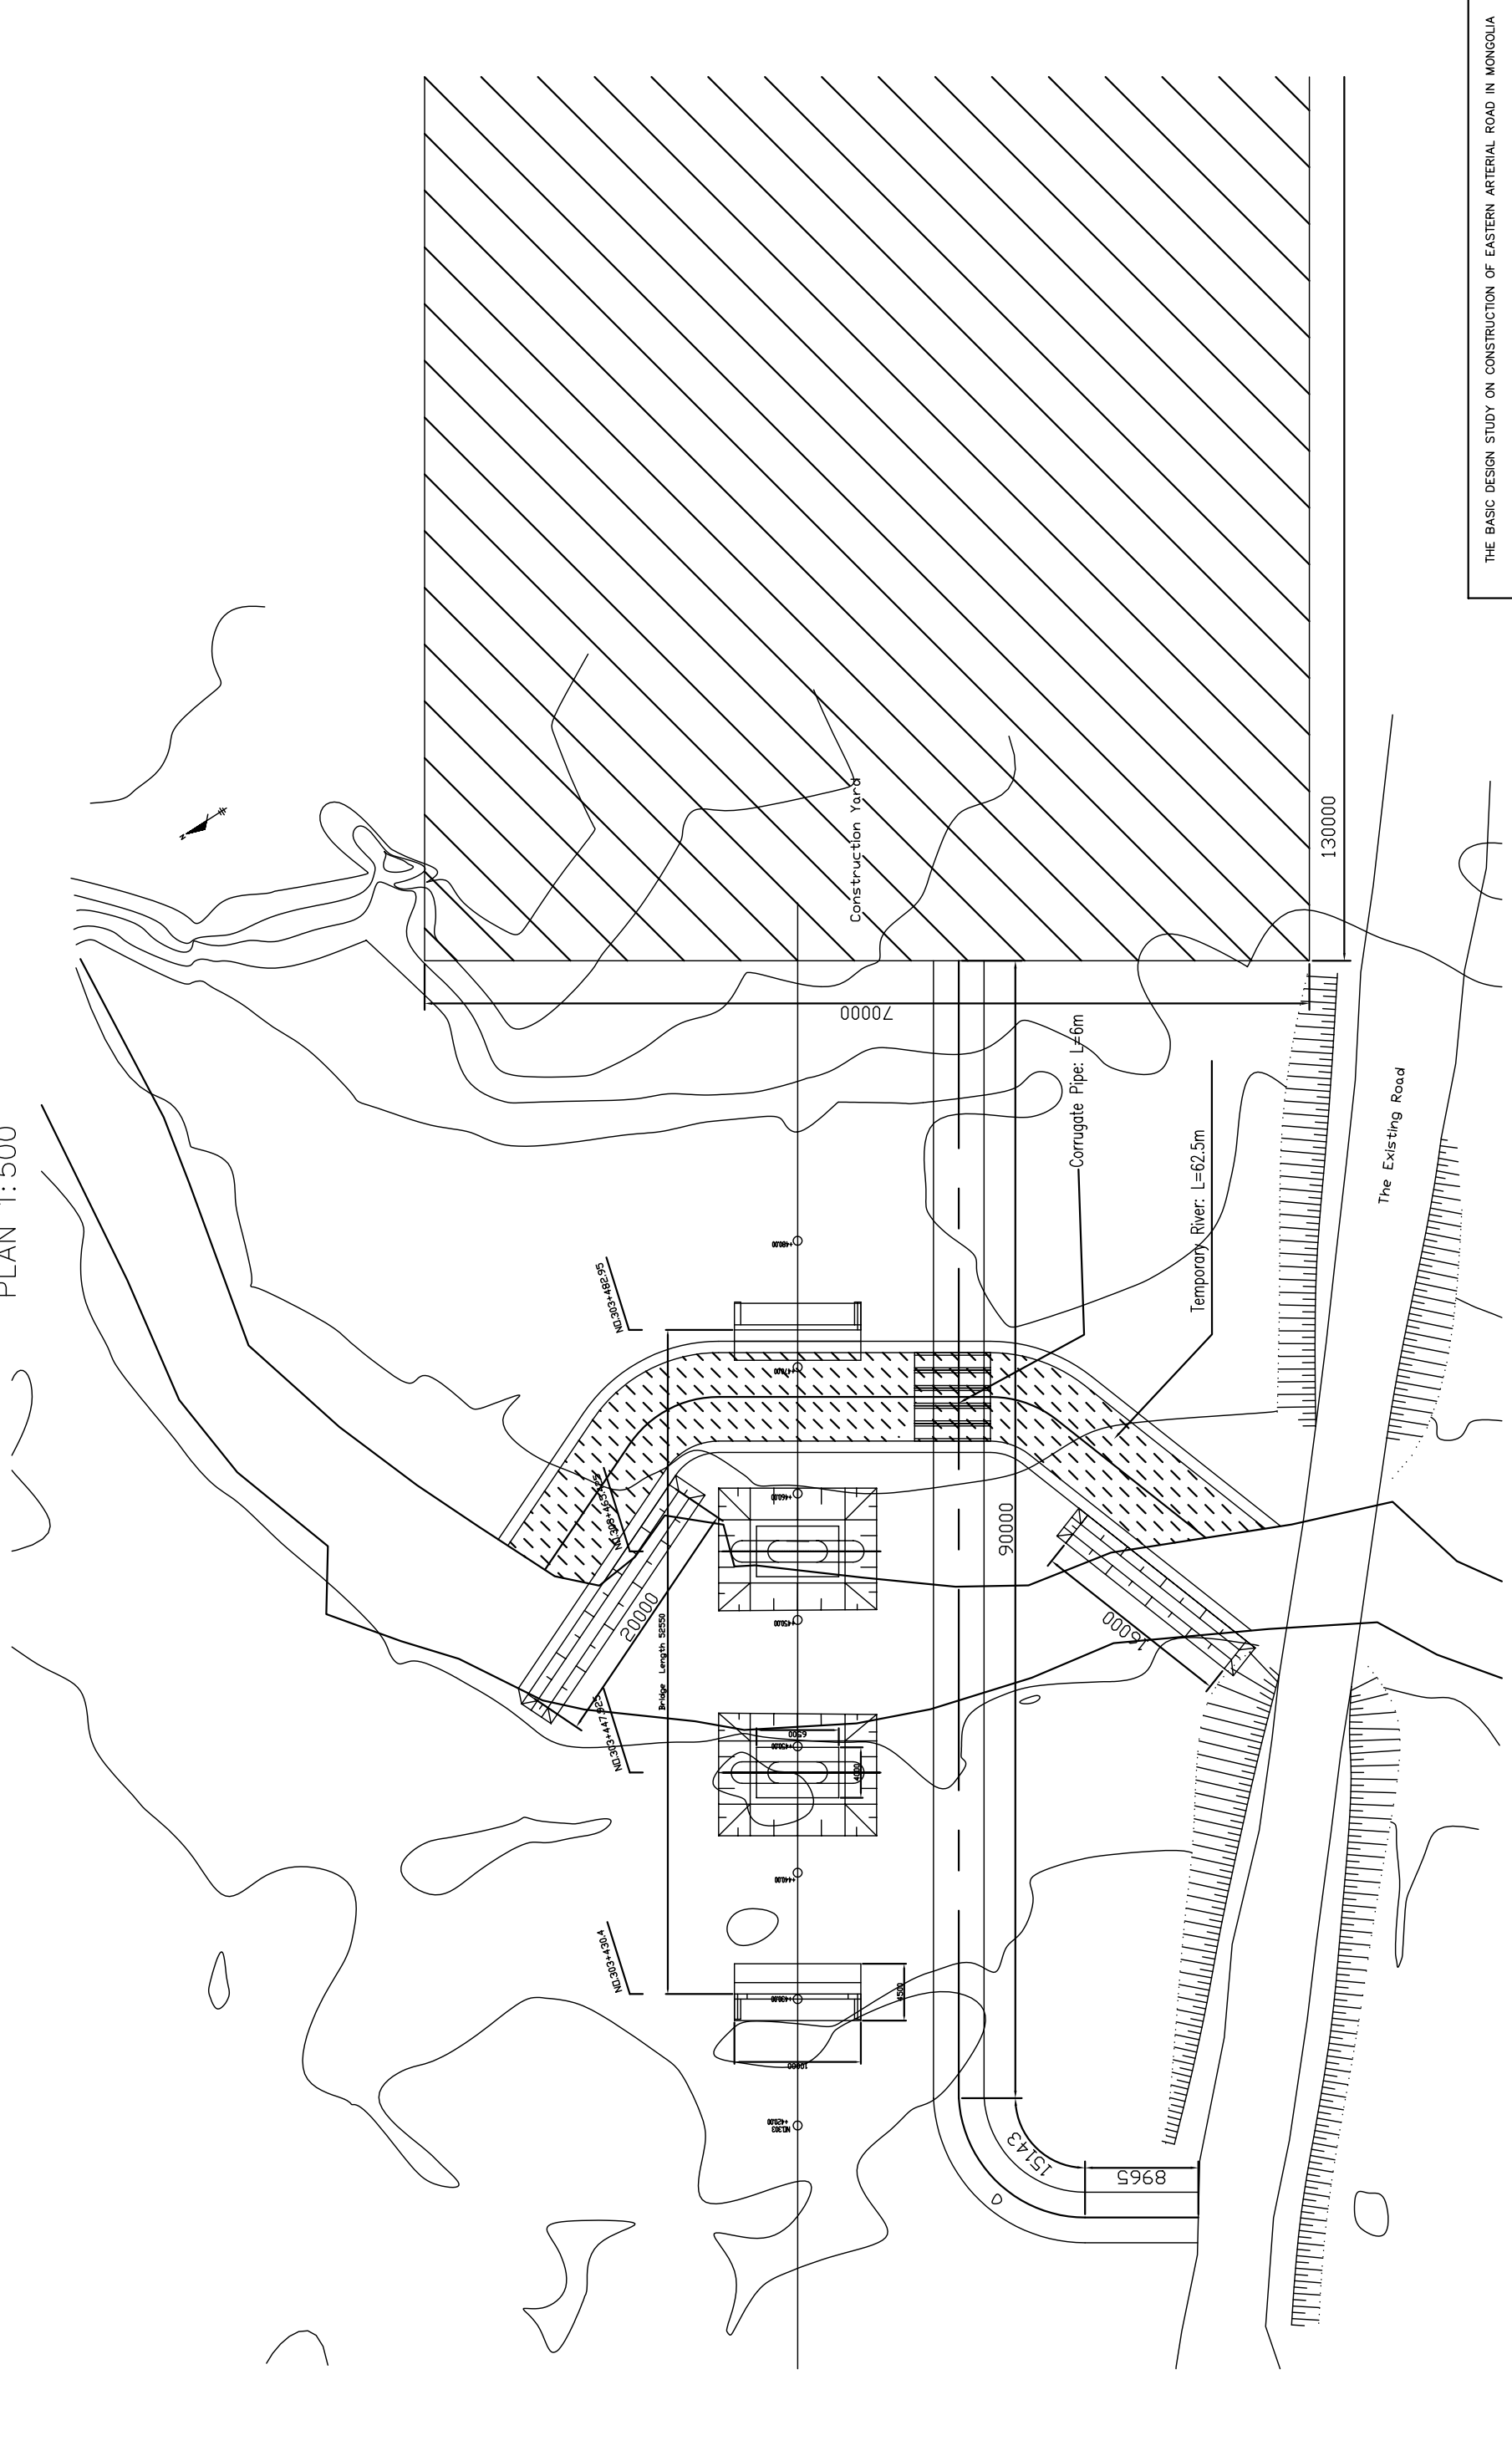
Construction Plan of Murun Bridge(1)
